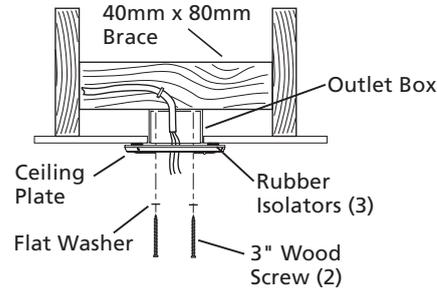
Attaching Ceiling Plate to 40 mm x 80 mm Brace
